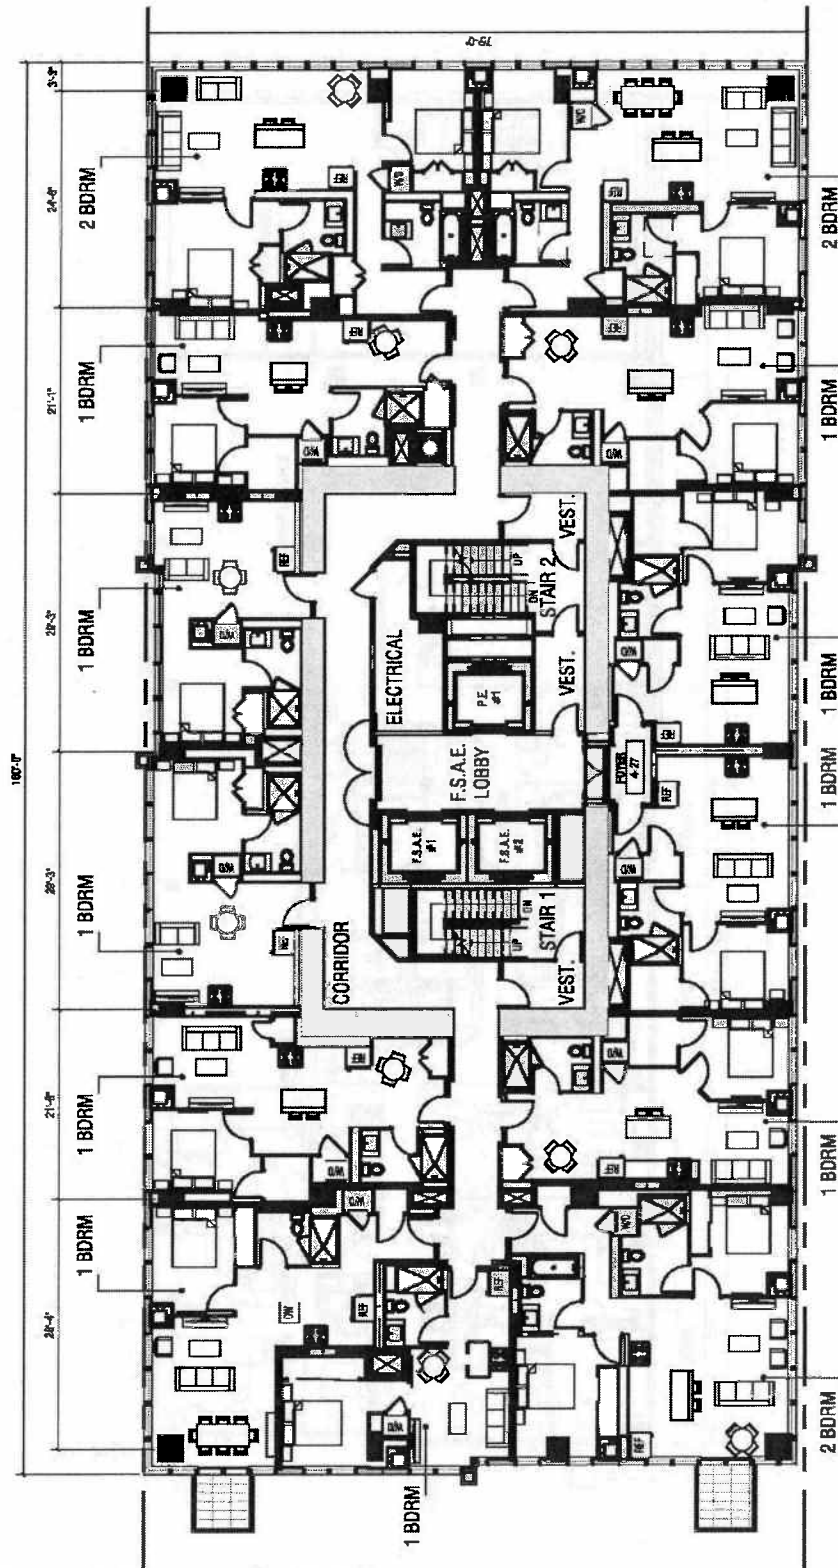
Proposed Typical Tower Floor Plan (Levels 4 through 34)
